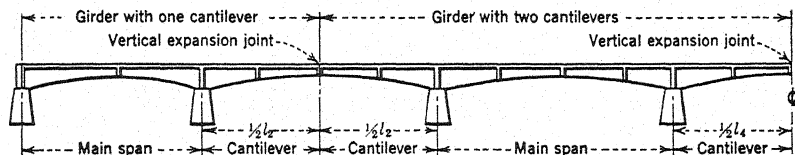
Bridge Design. Girders with Free Cantilevers. (See p. 129.)
